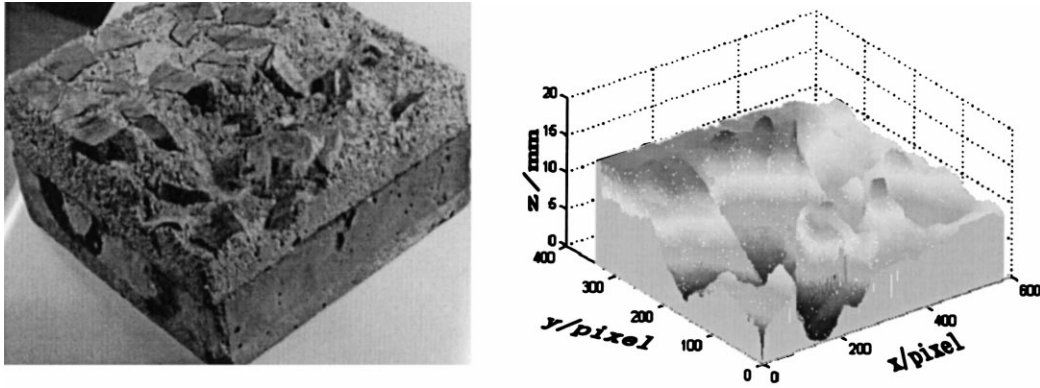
Reconstruction of fracture surface of concrete.
